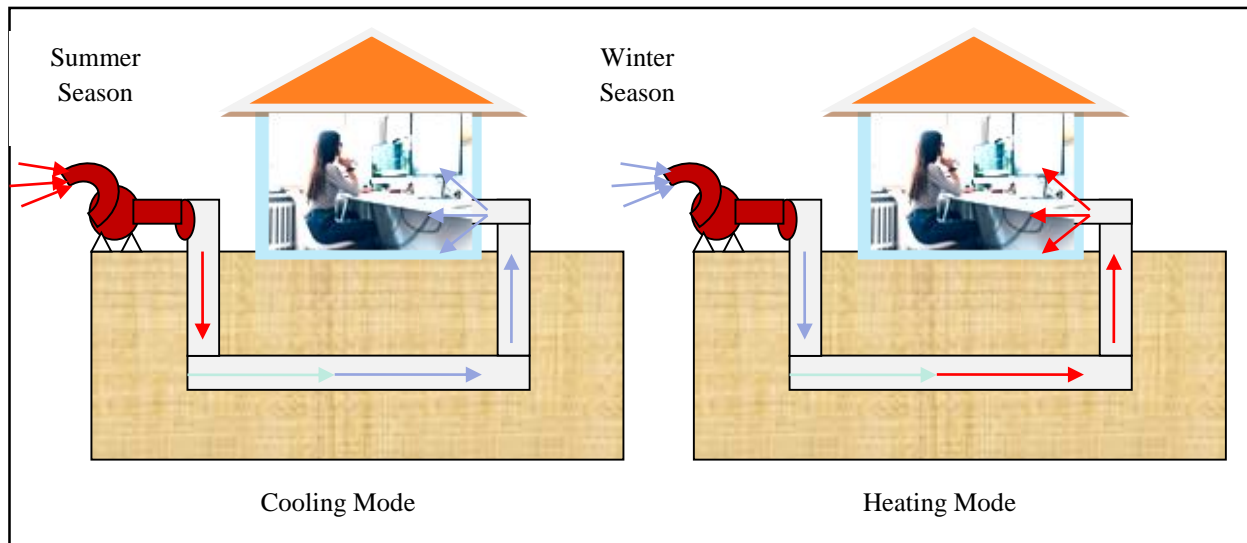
Earth air tunnel heat exchanger for cooling and heating mode in Buildings
